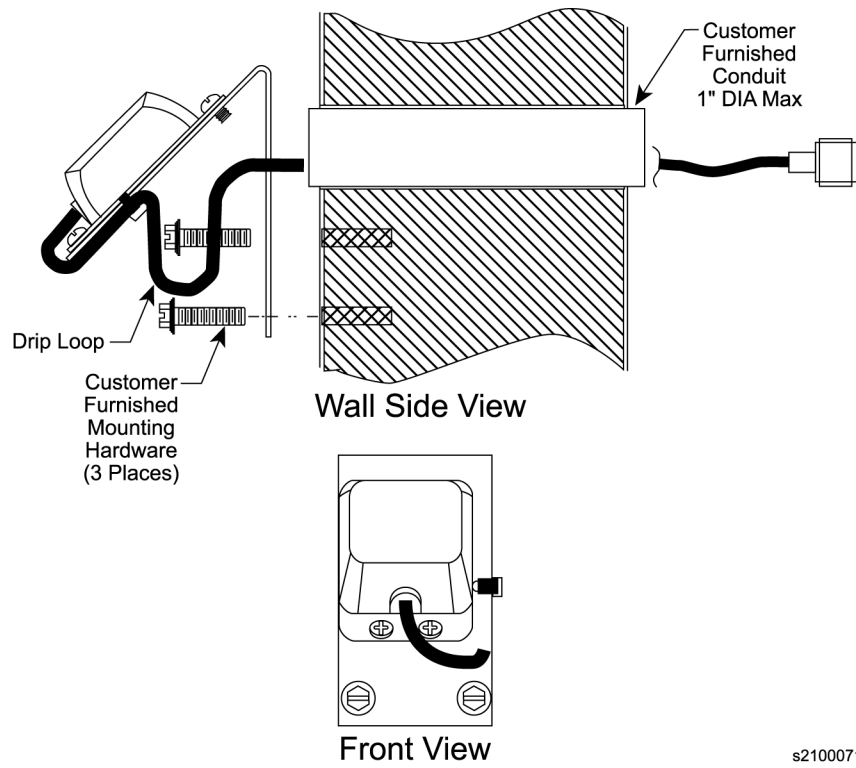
shows how a GPS antenna and wall-mount bracket are attached to a wall. Figure 3-15 provides the dimensions for hole size and location for the wall-mount bracket.
